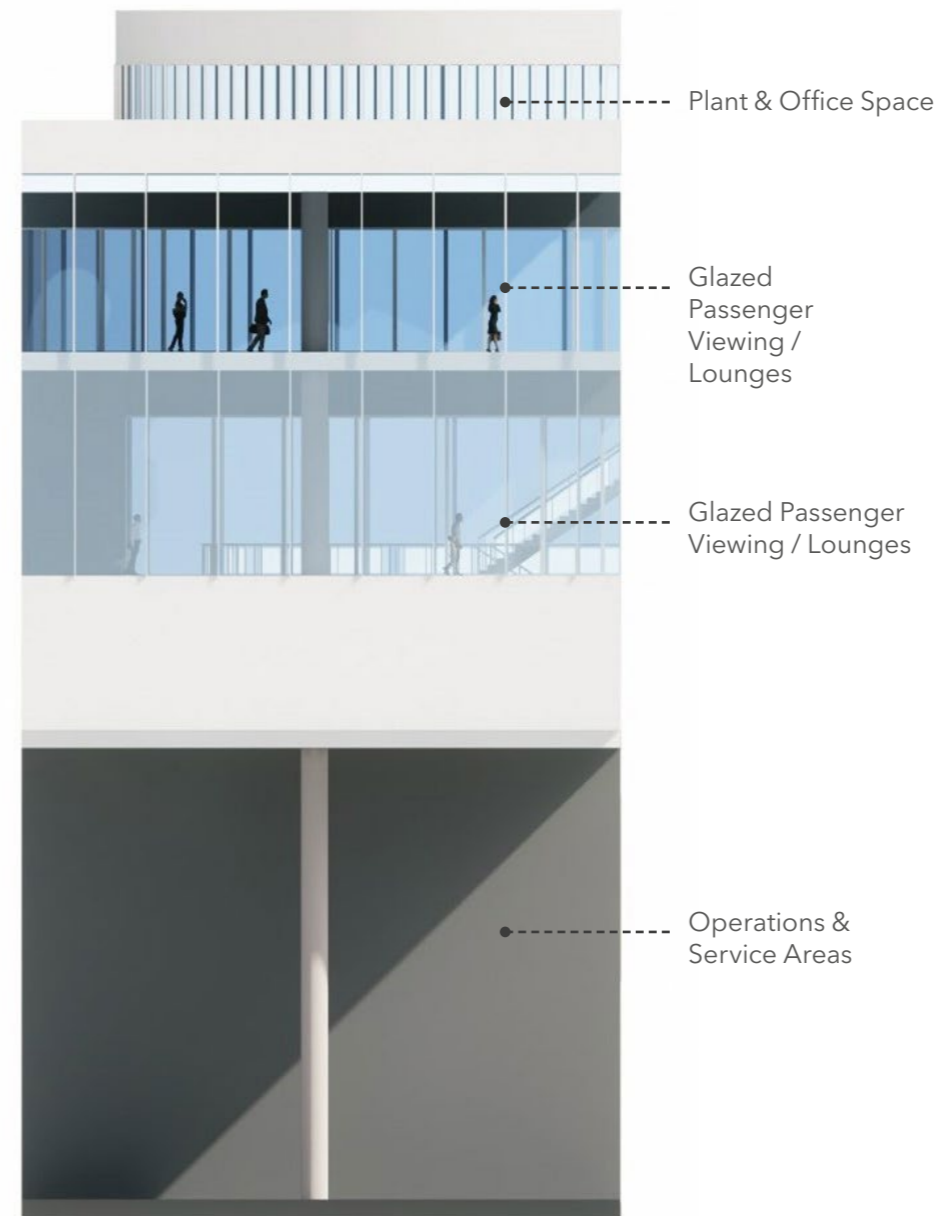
Indicative Elevation showing Typical 'Terminal Extension Building' Design
